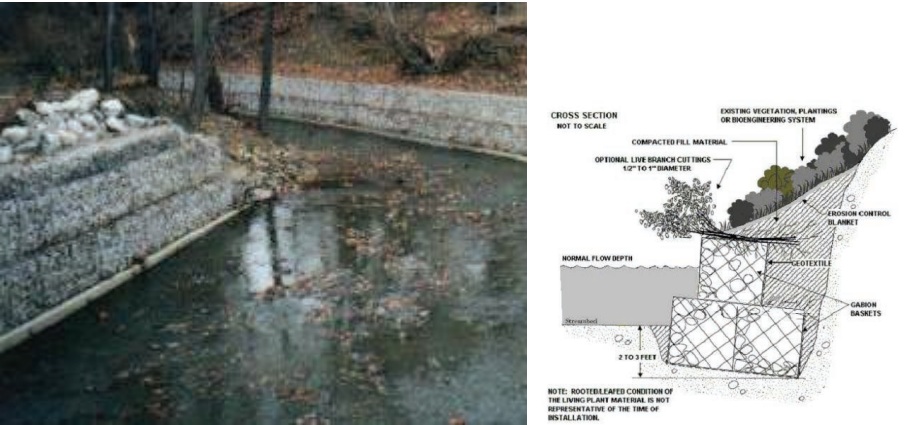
(Left) Example Streambank Stabilization Option 1 - Gabion Revetment System (Sample Photo : Courtesy of Gabion1, CA). (Right) Typical Gabion Revetment Section. (Courtesy of PA Department of Environmental Protection, Best Management Practices)
